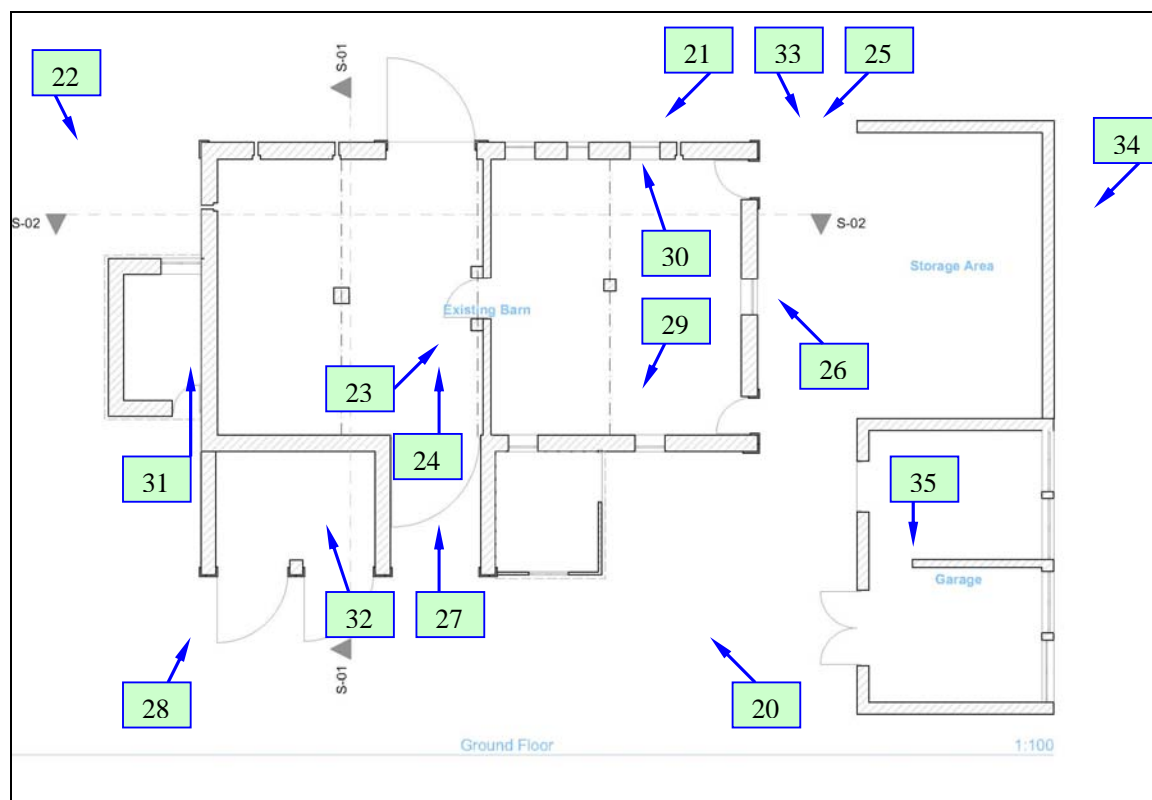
Ground floor plan of barn and garage and store, along with viewpoints of images 20-35 (Anderton Gables Chartered Building Surveyors)
